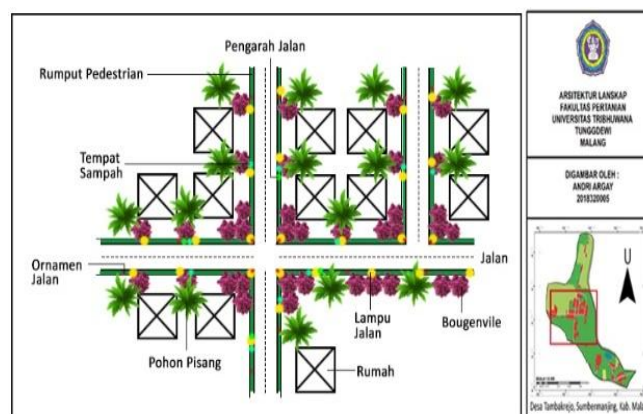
Road Site Plan of the Central Part of Sendang Biru Hamlet
